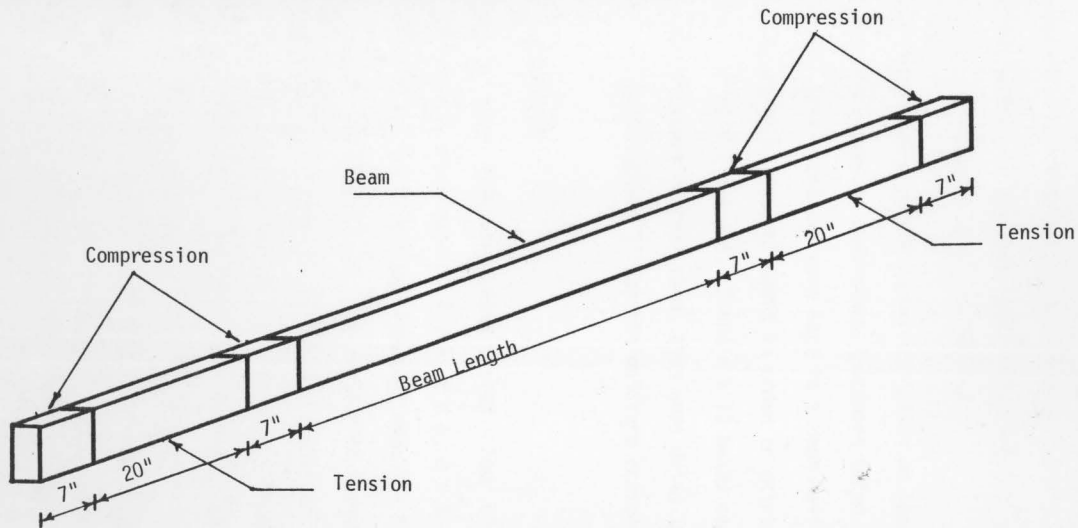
LOCATIONS OF BEAM SPECIMEN AND MATCHED COMPRESSION AND TENSION SPECIMENS IN A LUMBER PIECE
